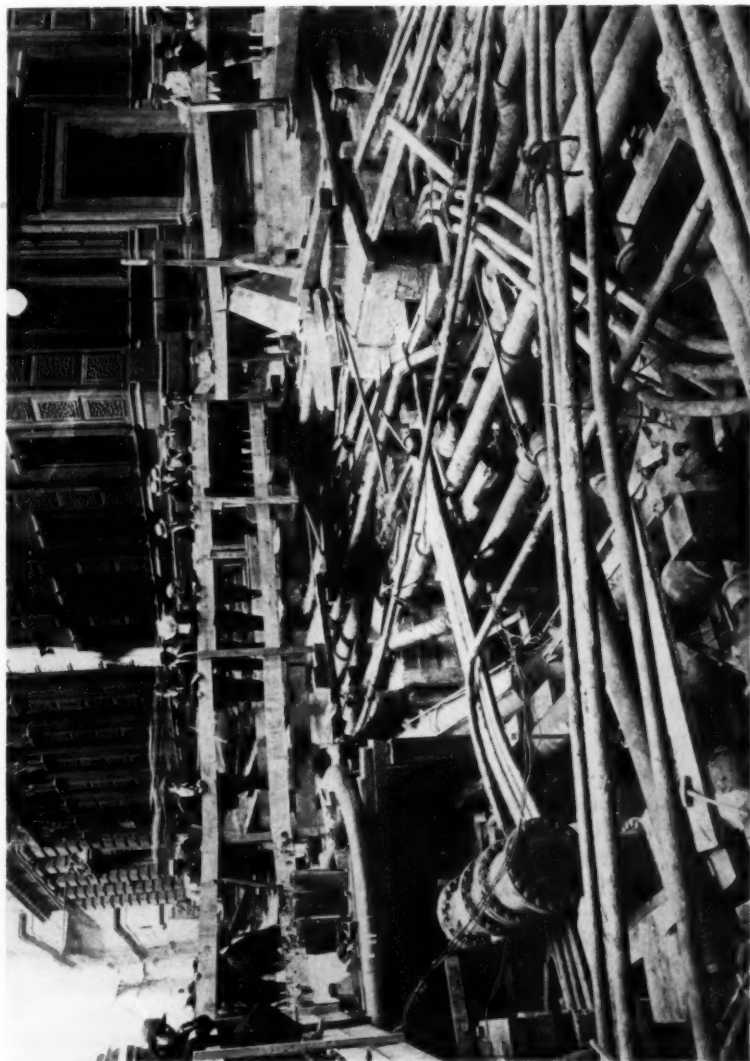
COMPLICATED SYSTEM OF PIPES BENEATH STREET SURFACE ENCOUNTERED IN SUBWAY EXCAVATION IN WILLIAM STREET AT THE CORNER OF WALL STREET
